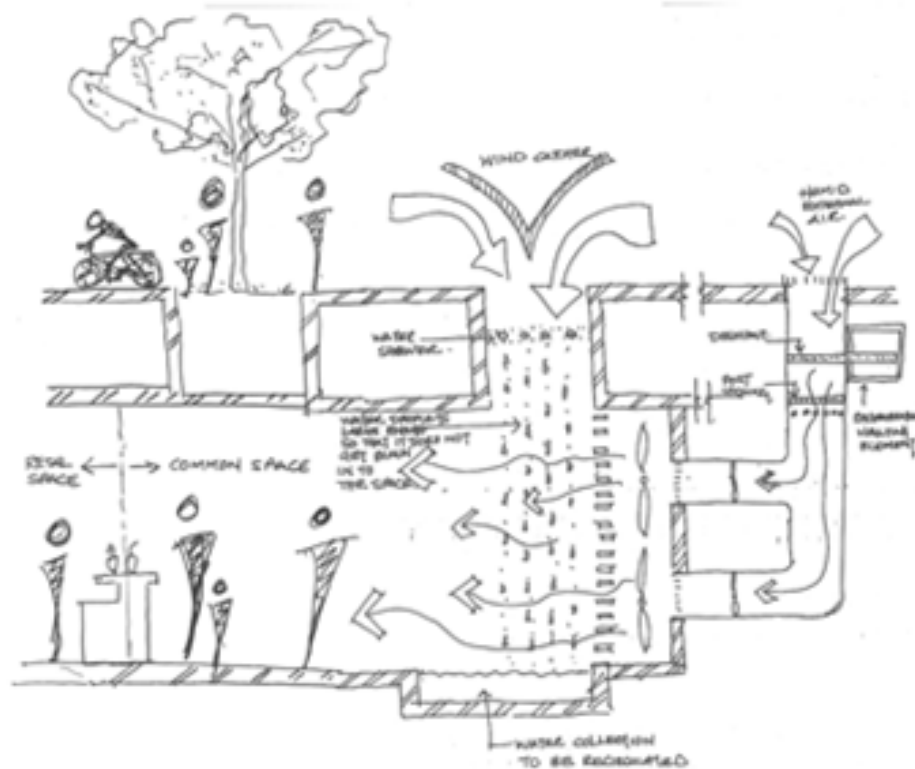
A schematic application of the indirect cooling system for underground buildings
